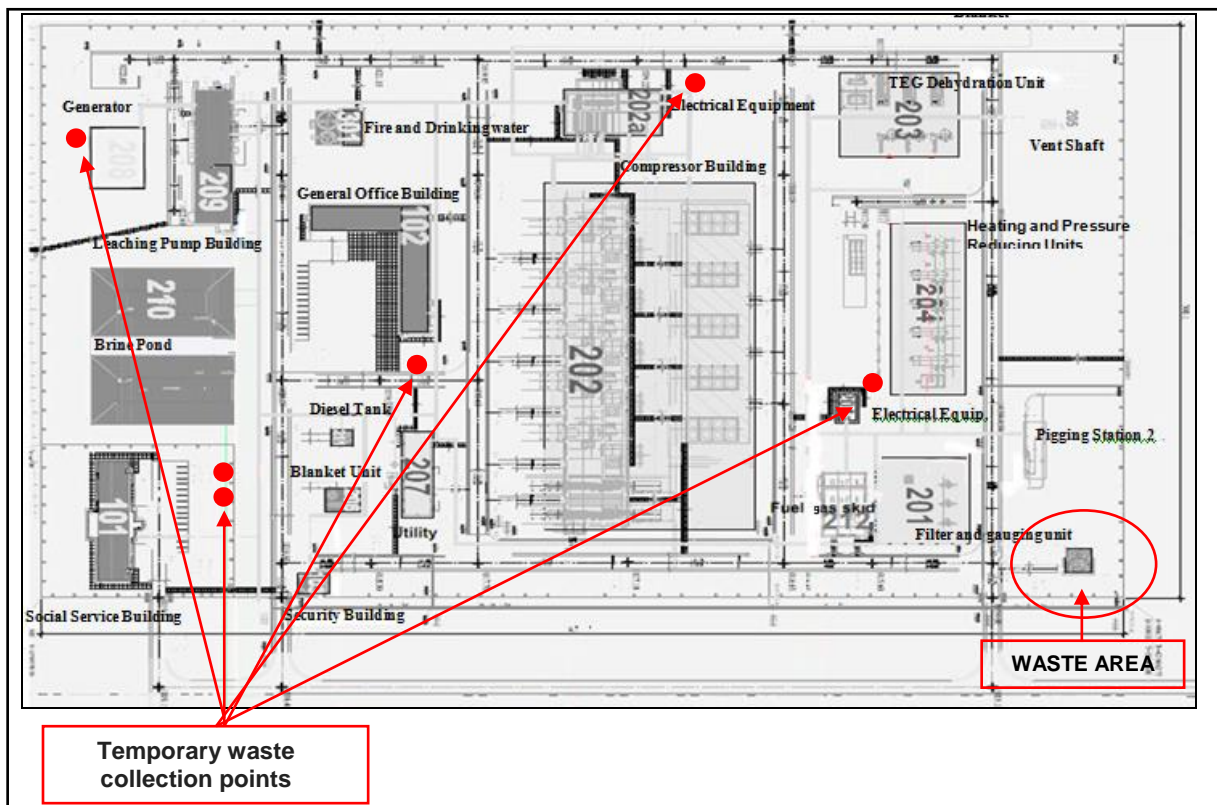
Surface Facilities Sample Layout Plan and Operation Facility Waste Area
